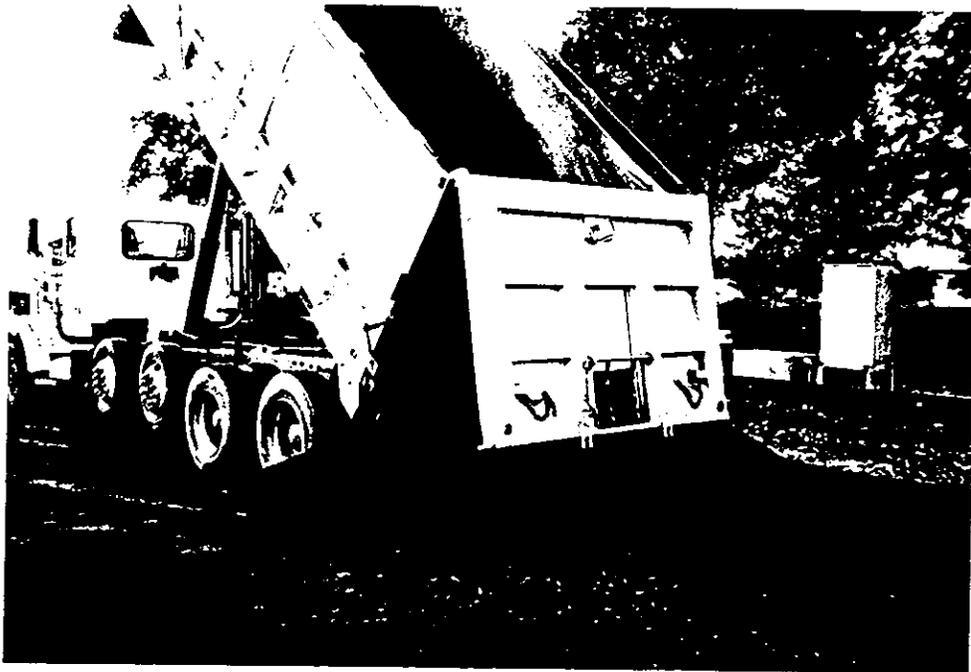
All surface rainfall/runoff was collected on site in the excavated areas during the soil manufacturing process.
